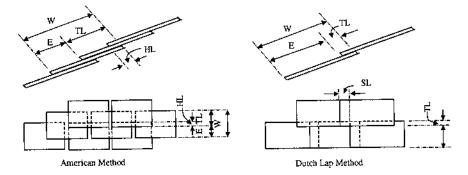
Shingle roofing terminology: E = exposure; TL = toplap; HL = headlap; SL = sidelap; W = width for strip shingles or length for individual shingles.
